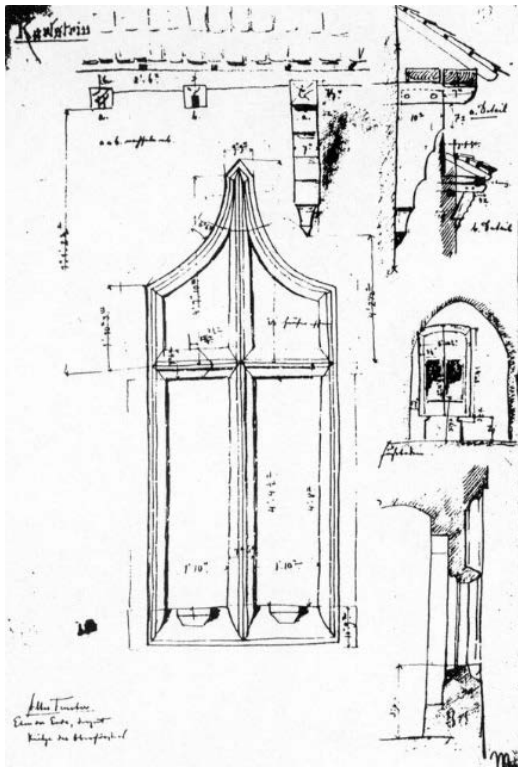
Josef Mocker, drawings – Karlstein, 1886
